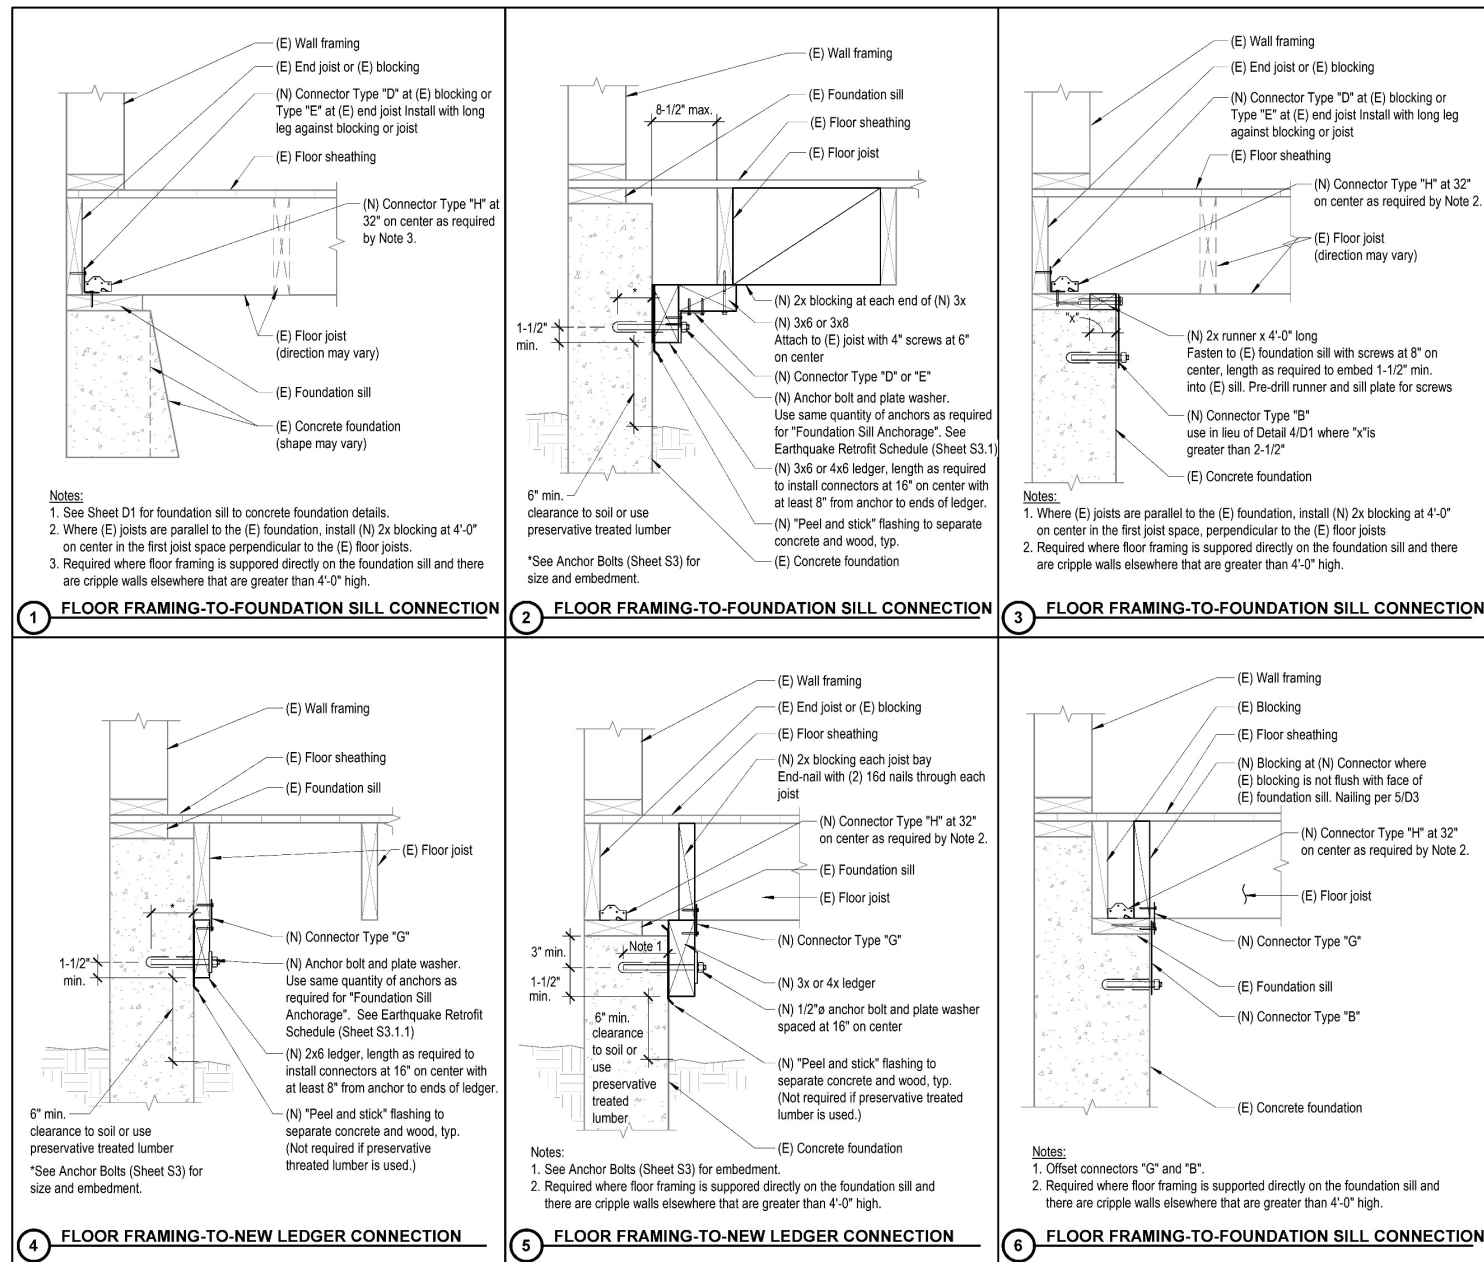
Floor framing to foundation sill connection details. Sheet D2.
